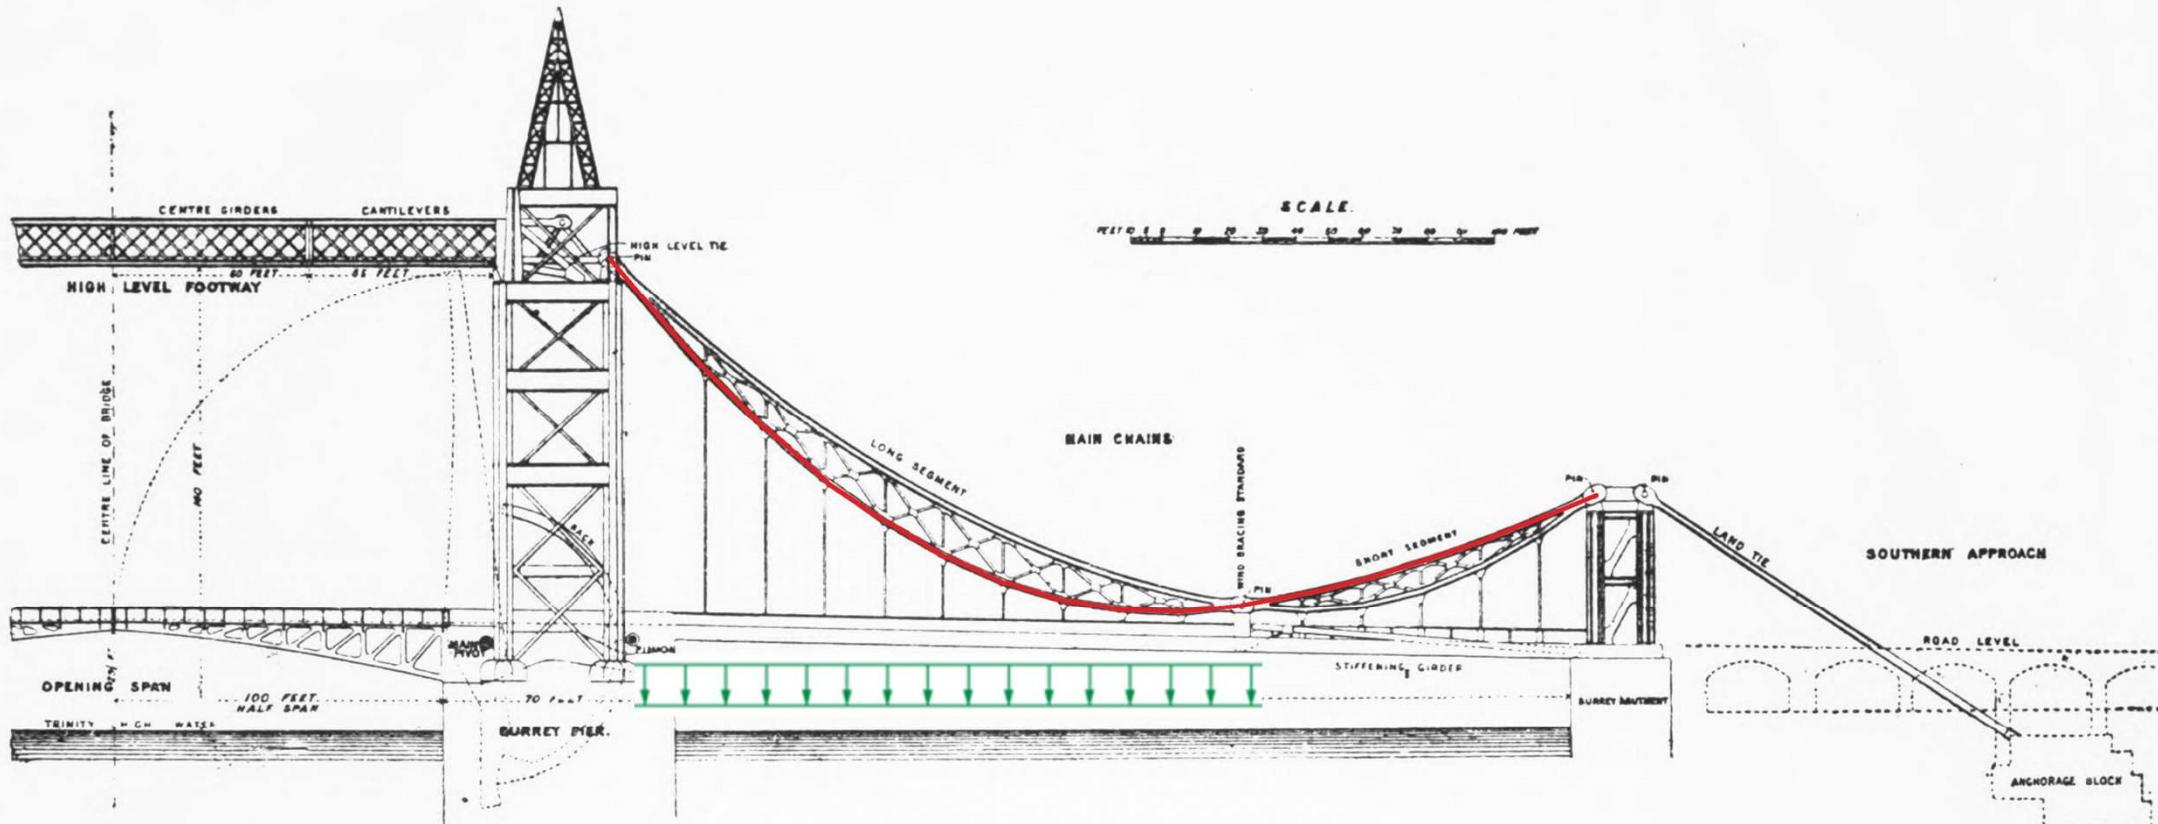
FIG. X. SKELETON HALF ELEVATION OF TOWER BRIDGE.
